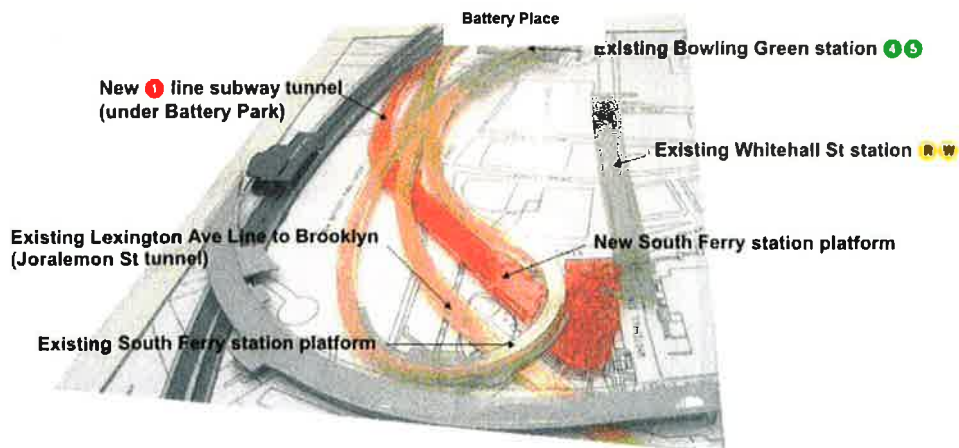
Existing & New South Ferry Stations and Surrounding Infrastructure (MTACC website)
